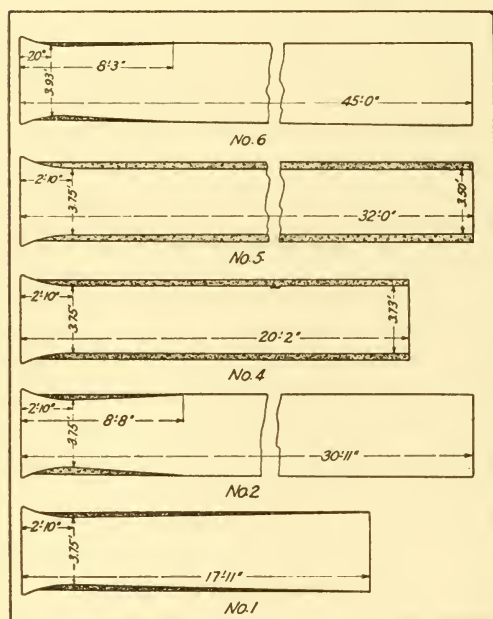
Experimental conduits, South Tunnel, Pathfinder Dam.
